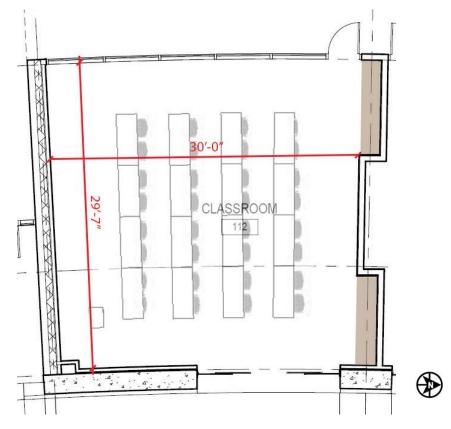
| Classroom Plan: Dimensions and Furniture Layout
